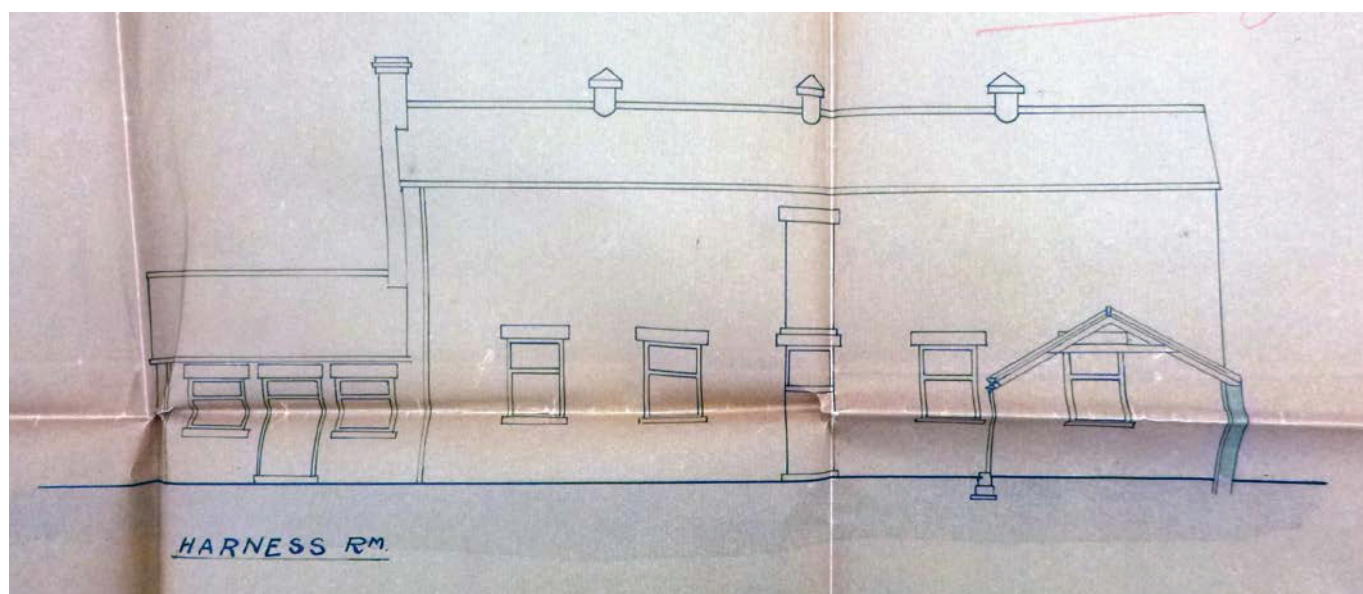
Elevation for proposed stables to the Old Brewery, 1898
